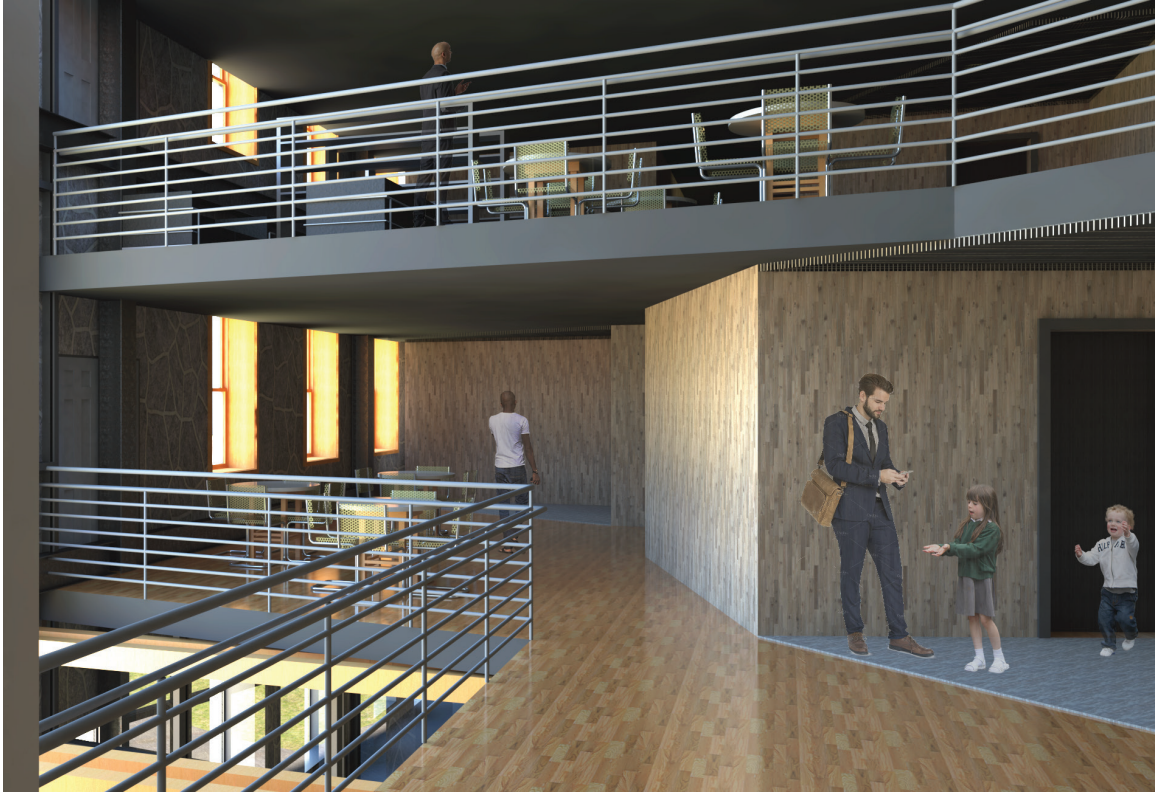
Second Floor Interstitial Space of Building Six Rendered Perspective
